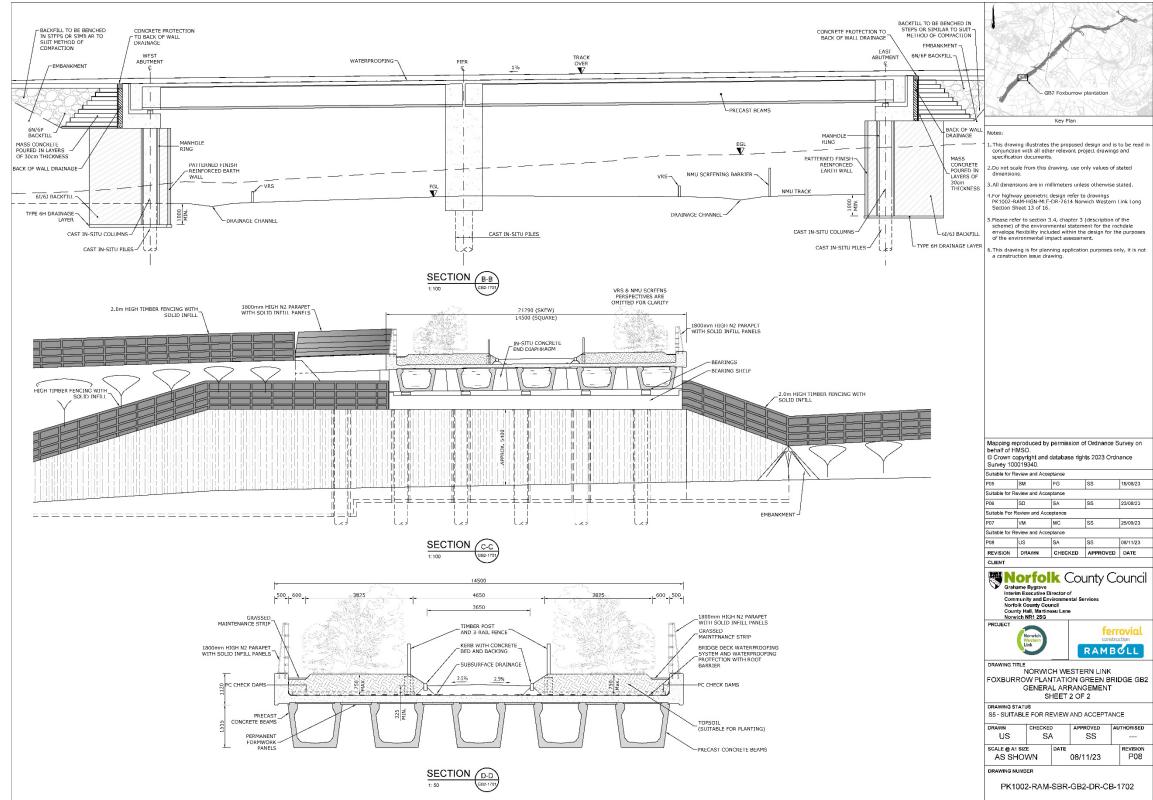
The General Arrangement Drawings for The Foxburrow Plantation Green Bridge GB2, illustrating the structural cross section of the green bridge
